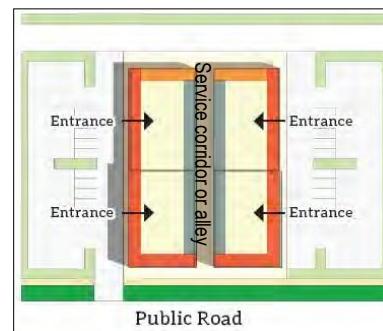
Option No. 2 Site layout for back-to-back buildings siding a public roadway.
